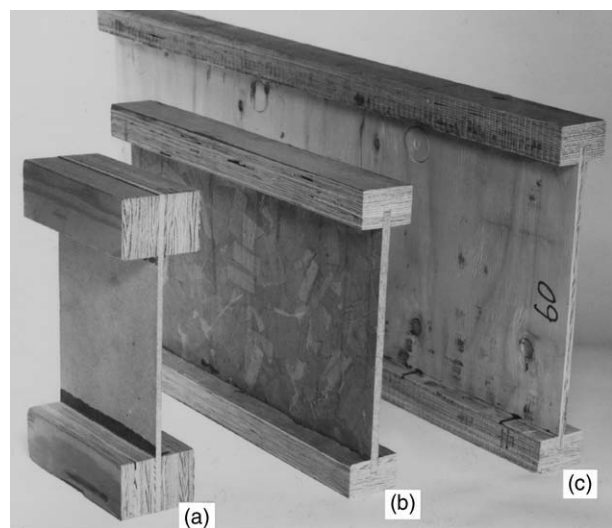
Prefabricated I-beams with laminated veneer lumber flanges and structural panel webs. (a) one experimental product has a hardboard web. The other two commercial products have (b) oriented strandboard and (c) plywood webs.
